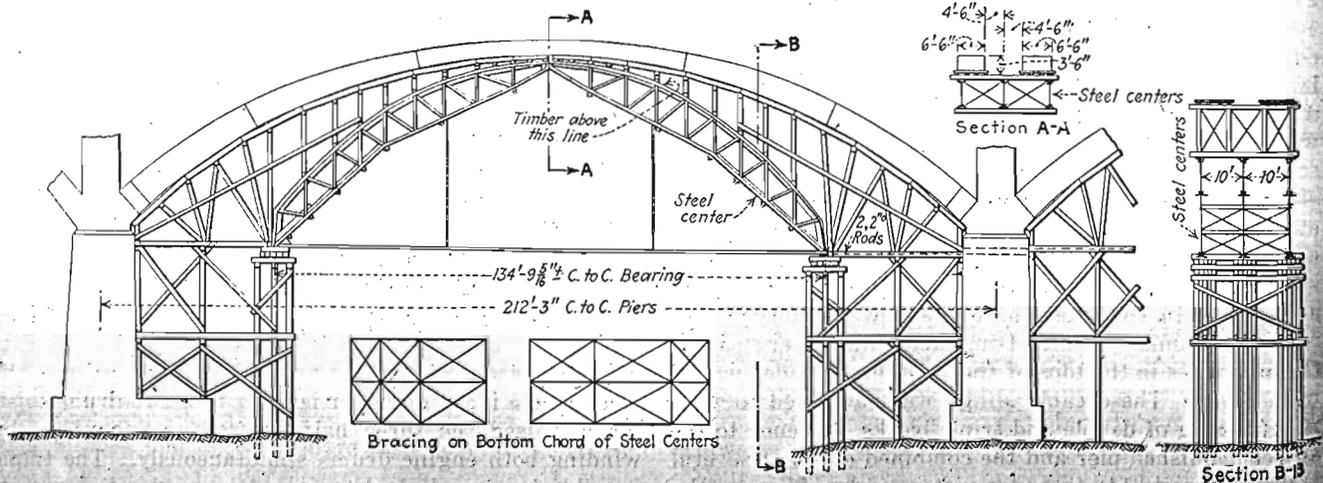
STANDARD ARCH CENTER BUILT OUT FOR LONGER SPAN
